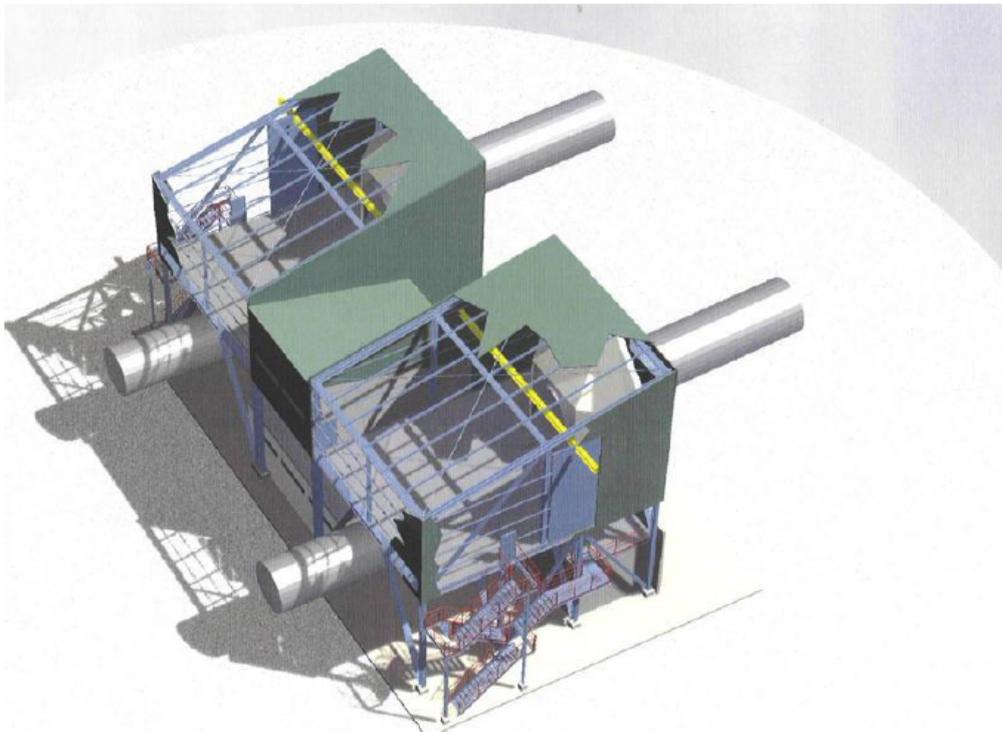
Firing Building & Satellite Control Room (Typical Arrangement)
